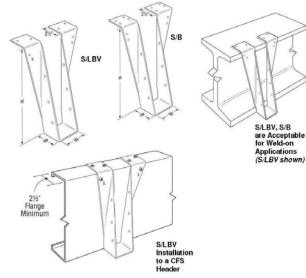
S/LBV & S/B JOIST HANGERS
